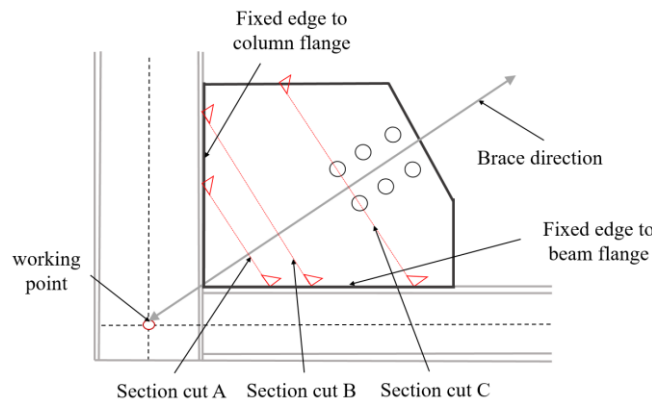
Schematic showing change in cross-section width of a gusset plate
